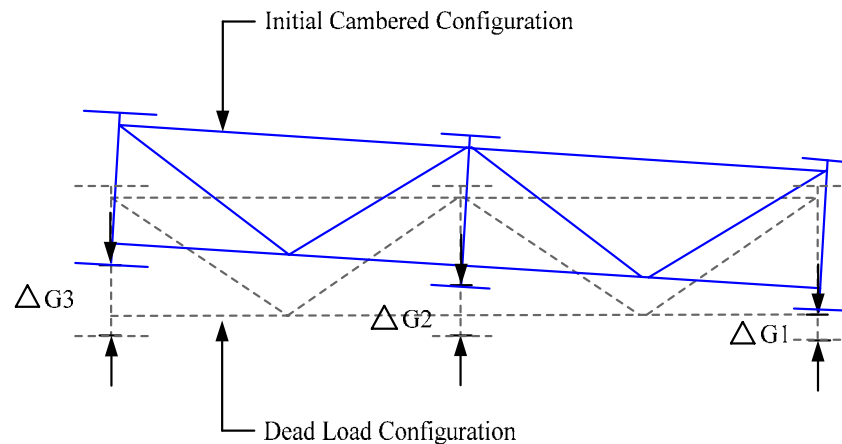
Initial cambered configuration and final dead-load configuration of bridge cross-section at a cross-frame location if the girders are twisted from their no-load web-plumb position to align them with the rectangular cross-frame geometry.
